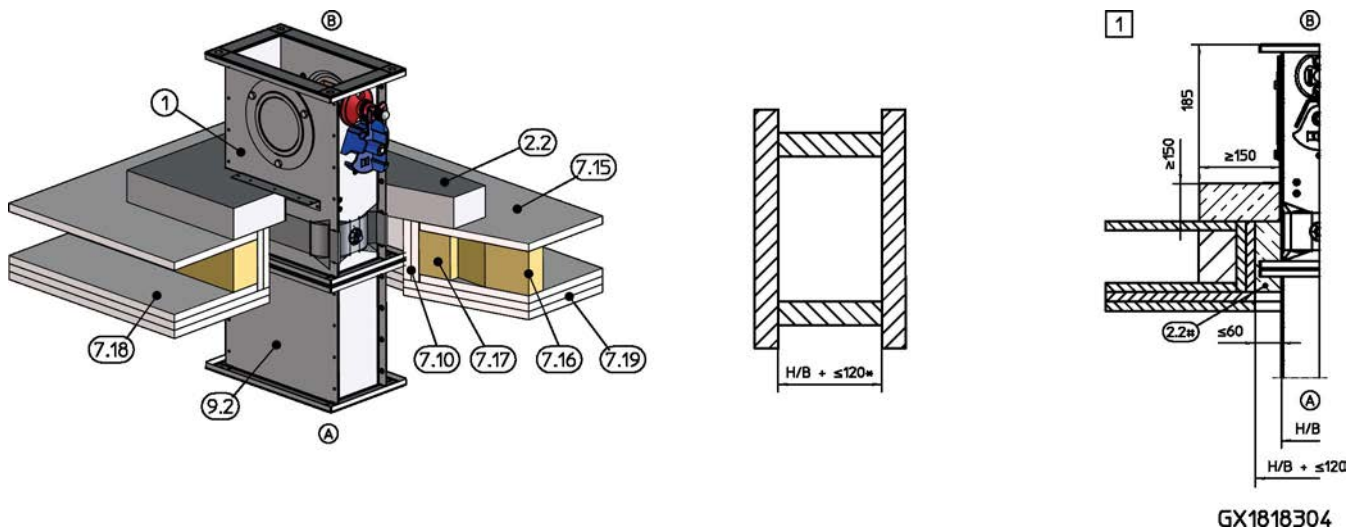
Mortar-based installation into a wooden beam ceiling up to EI 90 S, upright installation (shown; other structures upon request)
